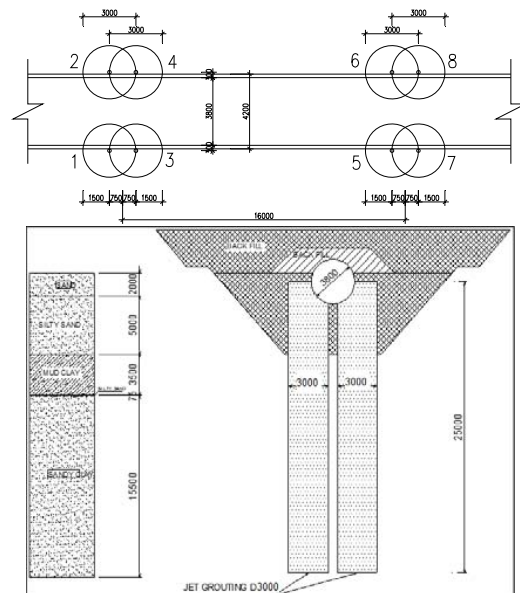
Layout of Jet Grouting underneath the existing CW pipe
